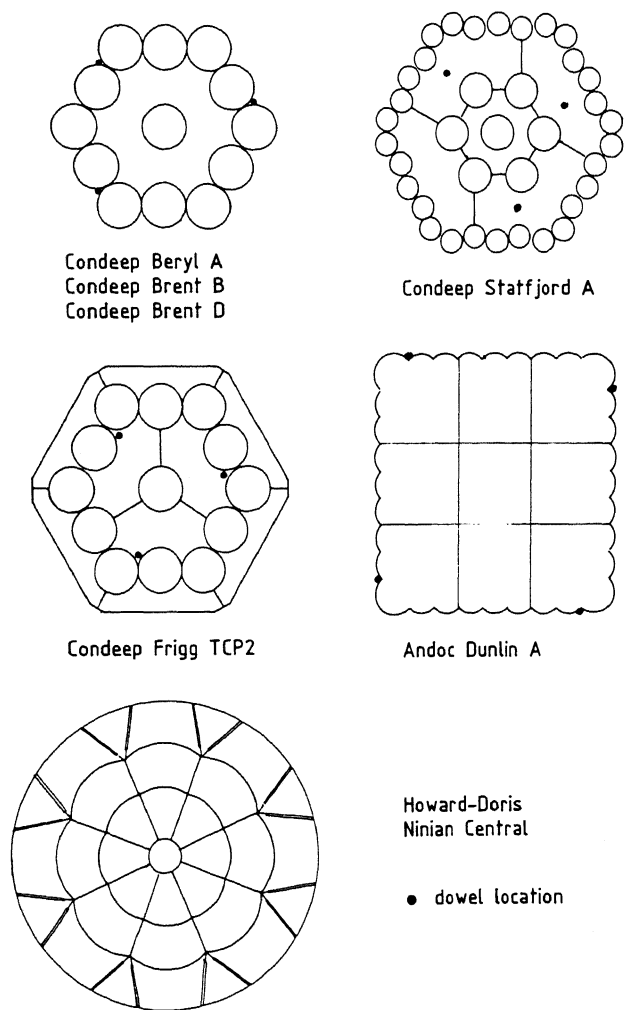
Geometry of steel skirts for some concrete gravity platforms.
